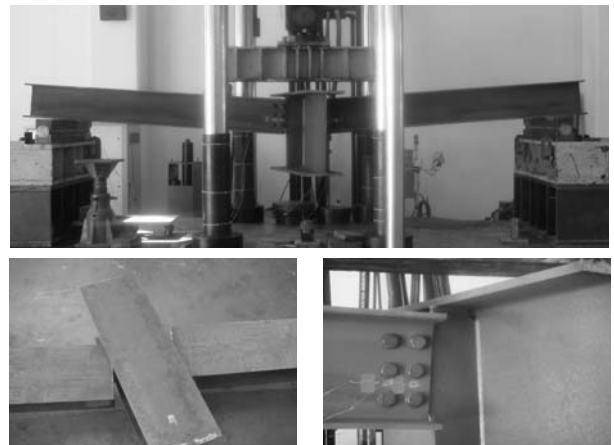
Failure of Test Specimen (Existing Temporary Bridge System)
